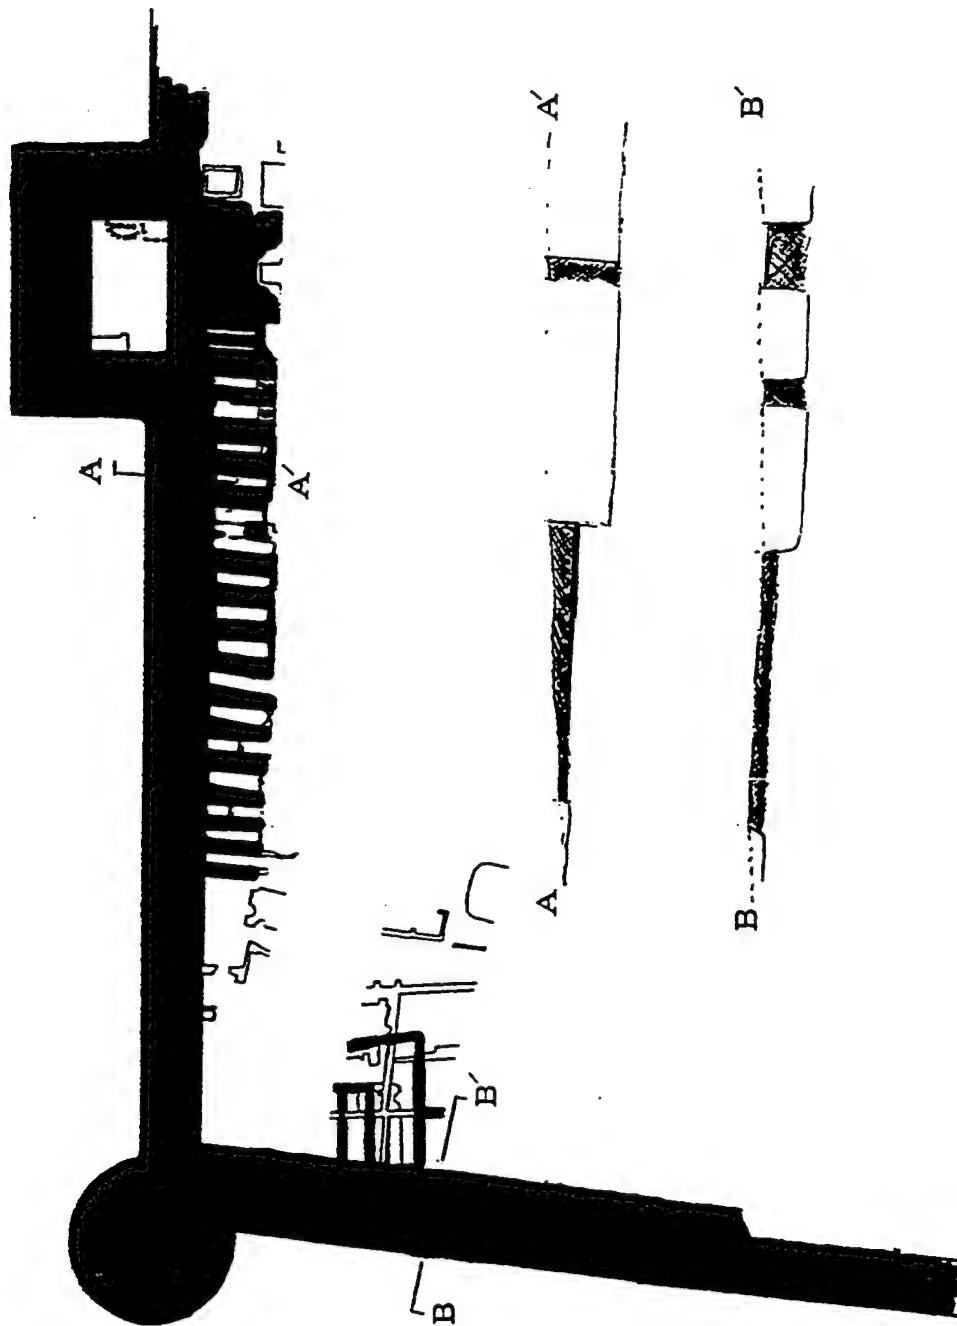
Exterior wall, north-west corner. Two sections across the wall demonstrate that the interior of the building had been excavated out.
